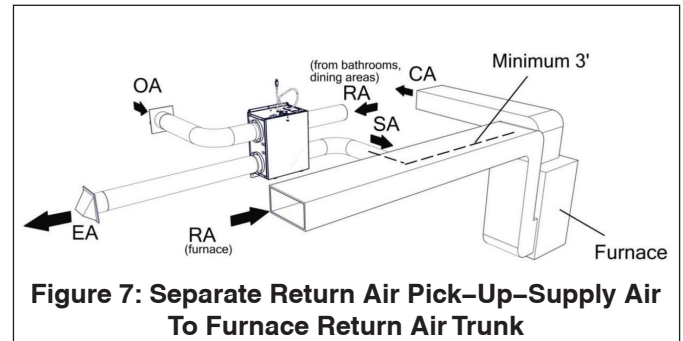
Separate Return Air Pick-Up-Supply Air To Furnace Return Air Trunk
